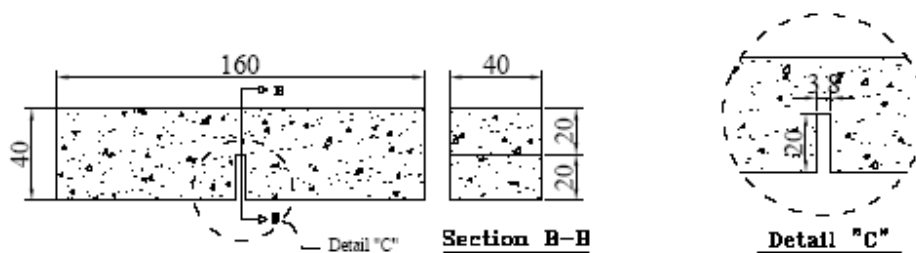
Geometry of the notch of the specimens (dimensions in mm)
